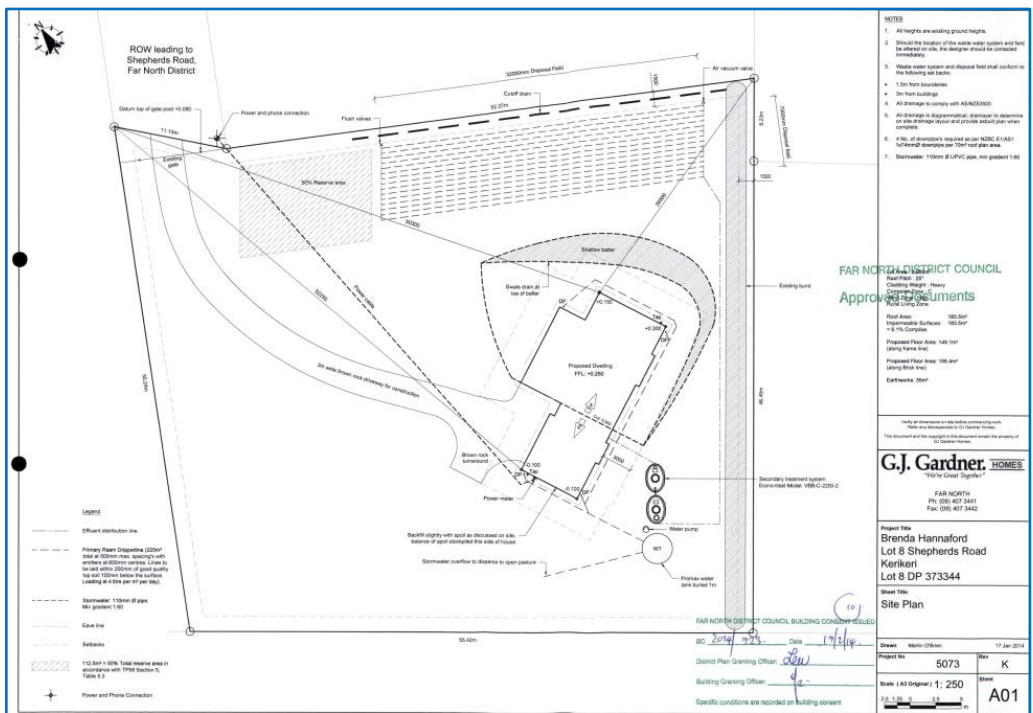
BC-2014-723-0 Approved Plan showing wastewater disposal system
